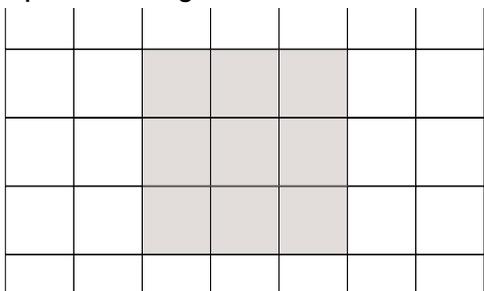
Horizontal Sheeting – Stack Bond Pattern
